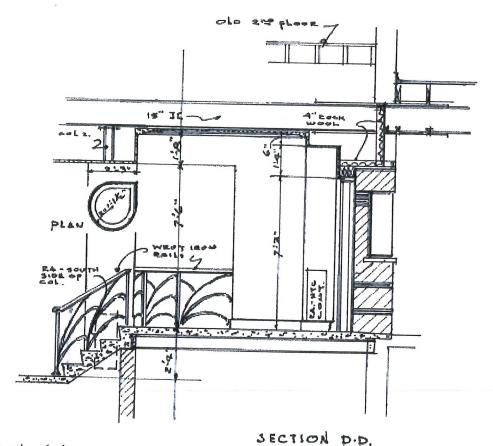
Sectional view across stairs and upper front lobby, looking south (original renovation plans)
